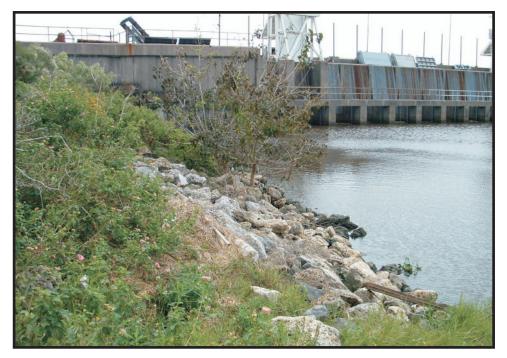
East bank of Alligator Bayou, intake side of PS 16, facing south (material in foreground to be removed)
